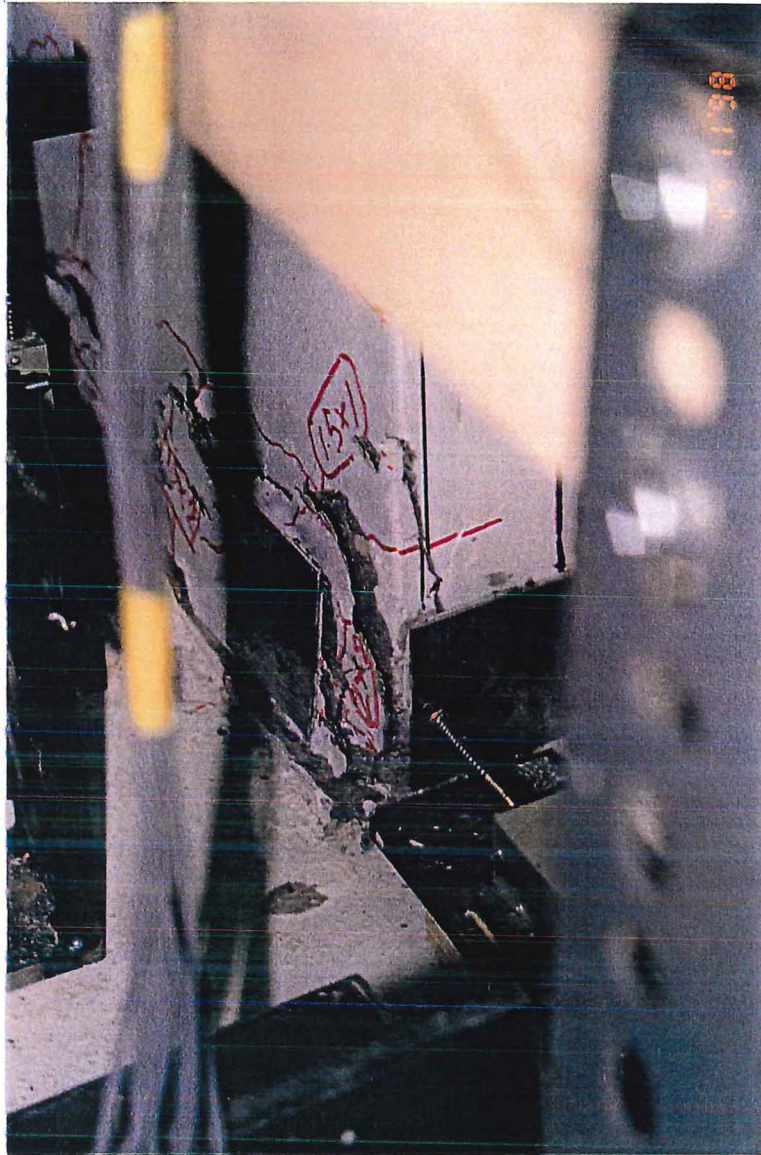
Unit 1: Spalling and twisting of the base of the wall on the compression edge (East edge) at $\mu_d = -2.5 \times 1$
